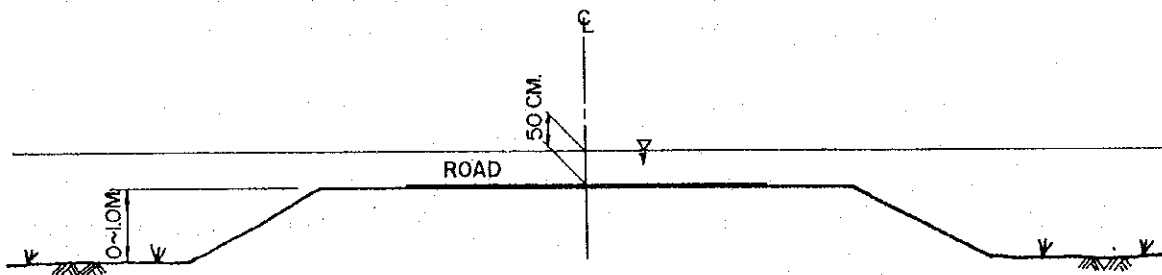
Cross Section of Route 1256 at Km. 1.1
